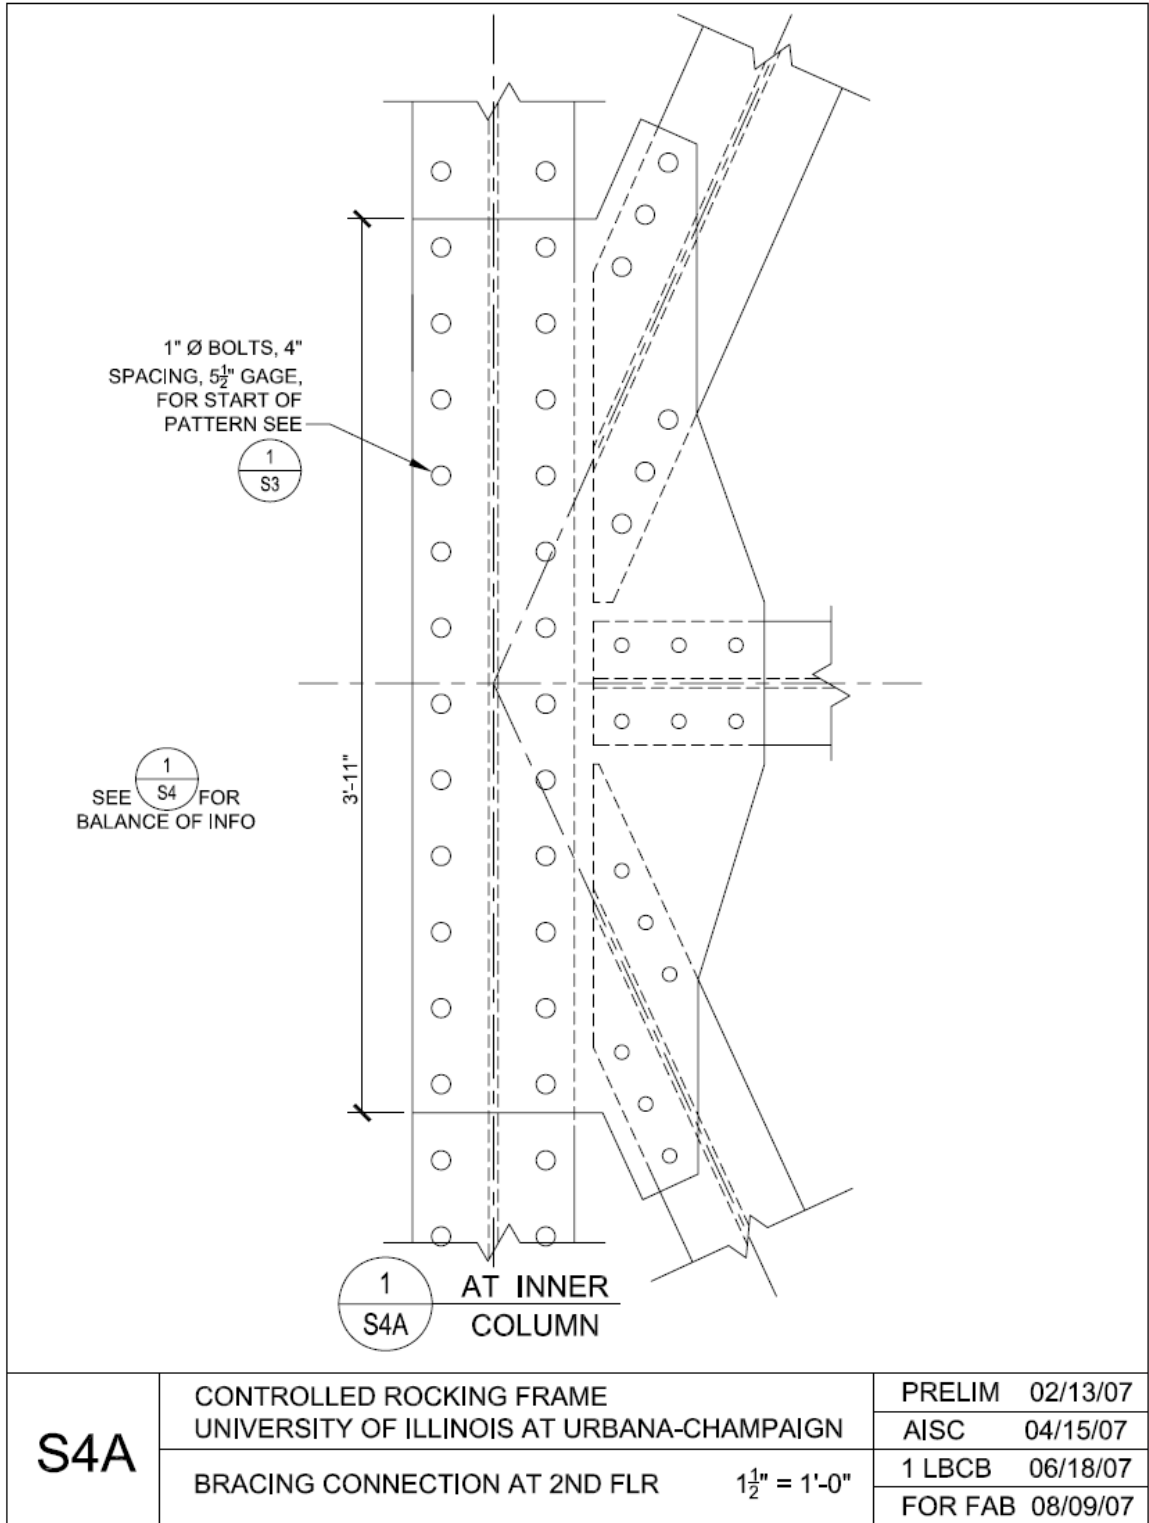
Specimen Design Drawing – Bracing Connection at 2nd Floor
